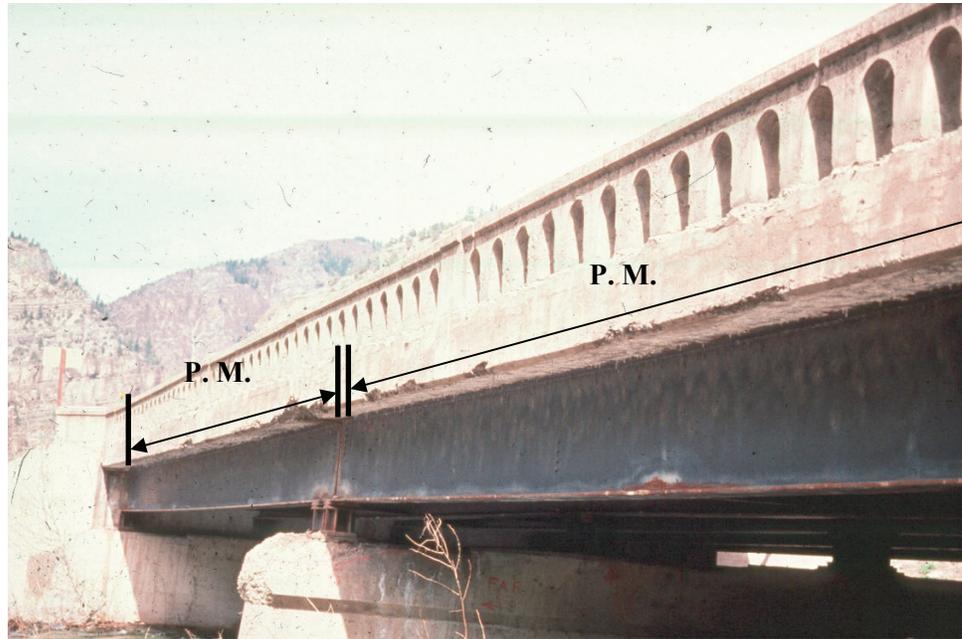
Flexural Zone on a Simple Rolled Multi-beam Bridge is Entire Length of Beams Between Supports
